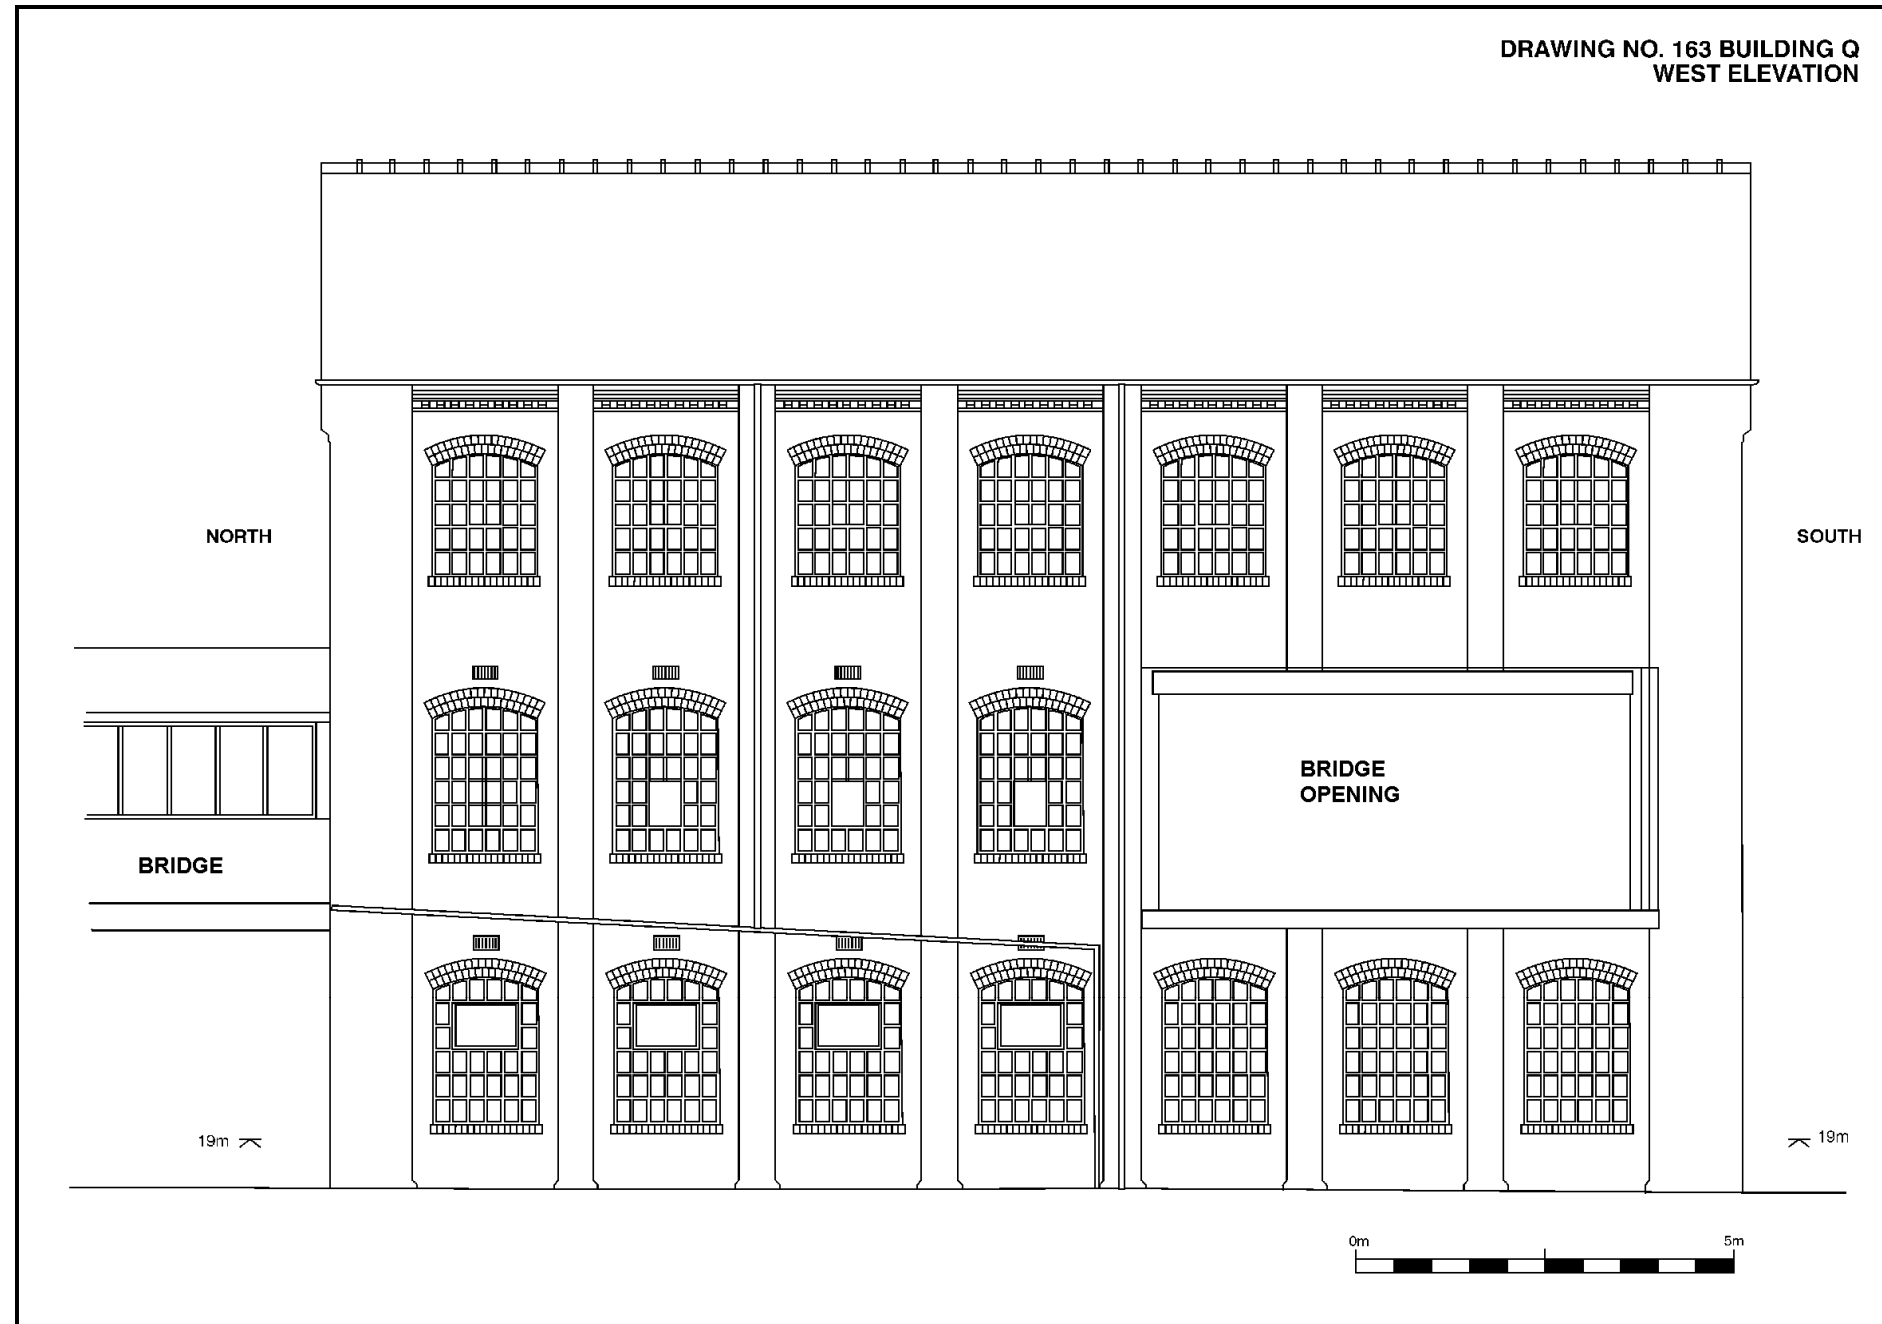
Survey drawing of the west elevation of Building Q (scale 1:100)
